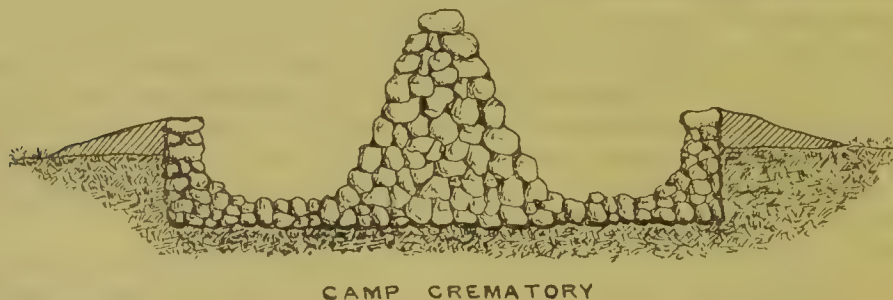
SECTIONAL VIEW OF CAMP CREMATORY.
